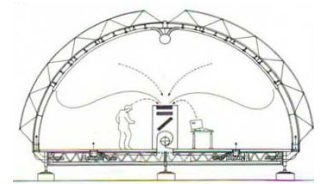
IBM TRAVELLING PAVILION BY RENZO PIANO
